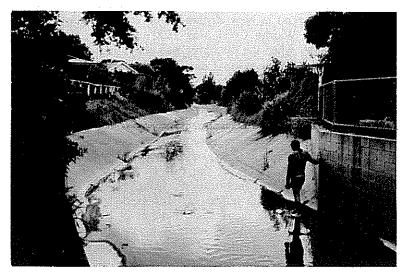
The enlarged and concrete-lined channel of the Wairau Creek immediately downstream of the Alma Road gauging site.
